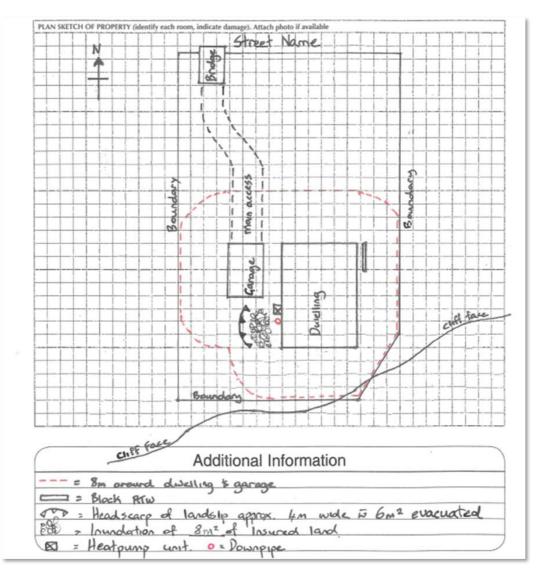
Site sketch of land damage with imminent damage to the dwelling
